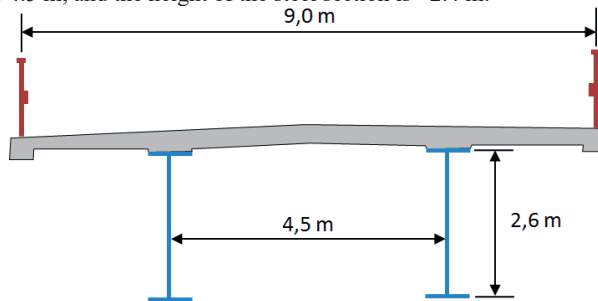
Typical cross-section of the superstructure for the chosen part of the bridge.
